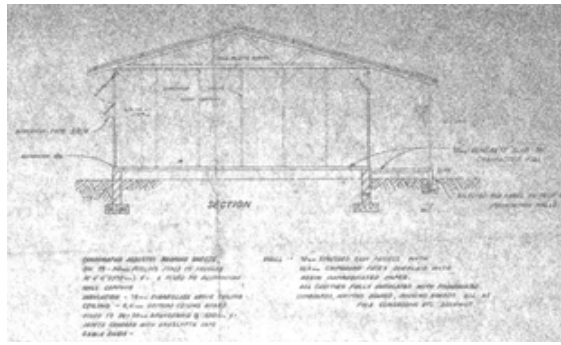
Bonteheuwel Secondary School: Section to show 'Class A' roof on typical public school built in 1960s (Bruply 1974)
